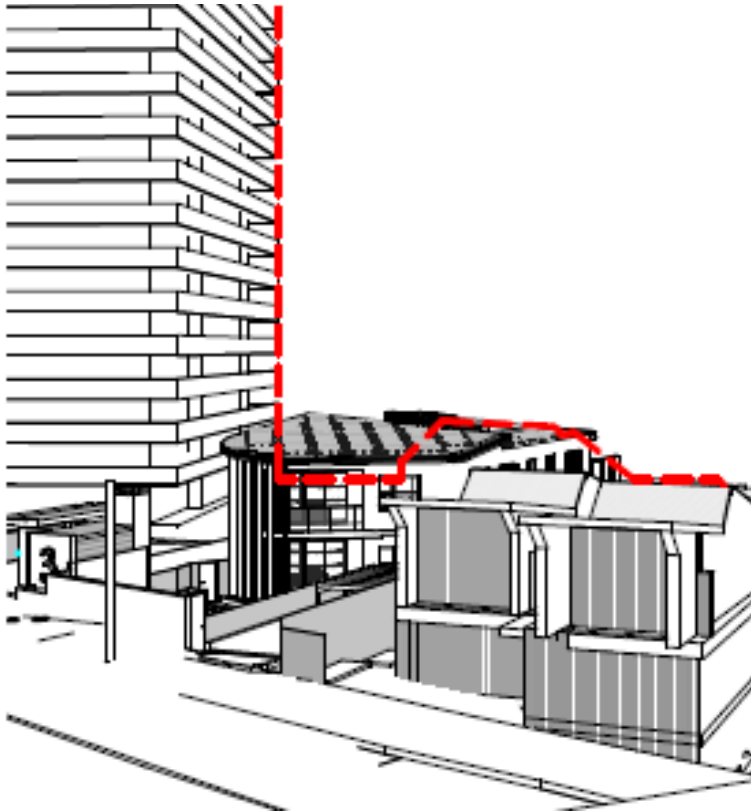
Plan Extract: Level 2 balcony view from 8-10 Lauderdale Avenue.
